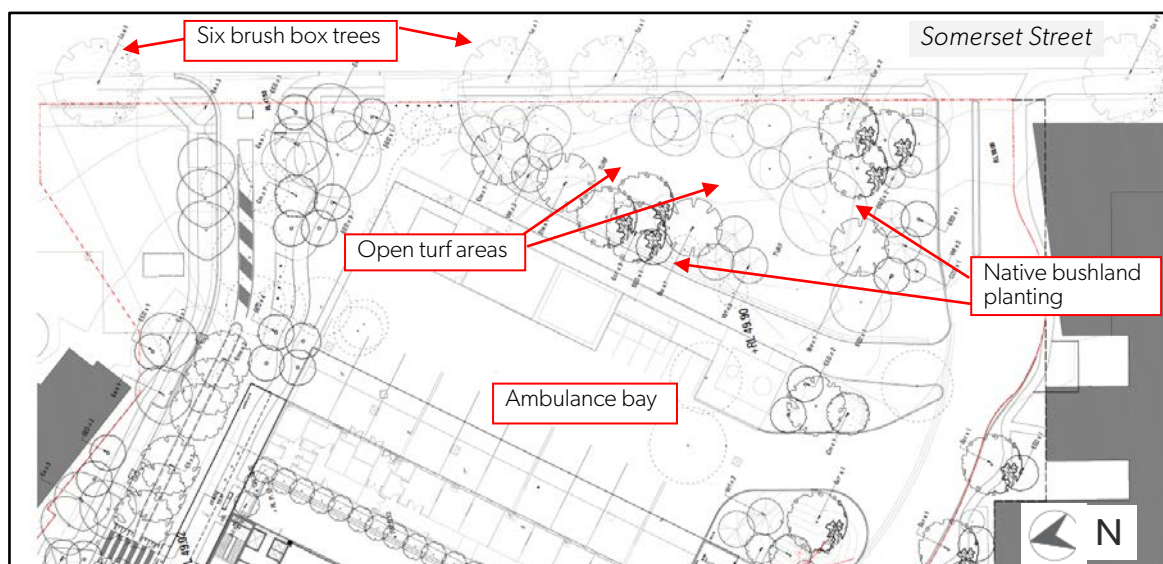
| Proposed landscape area near Somerset Street (Sheet 107) (Source: RtS)
